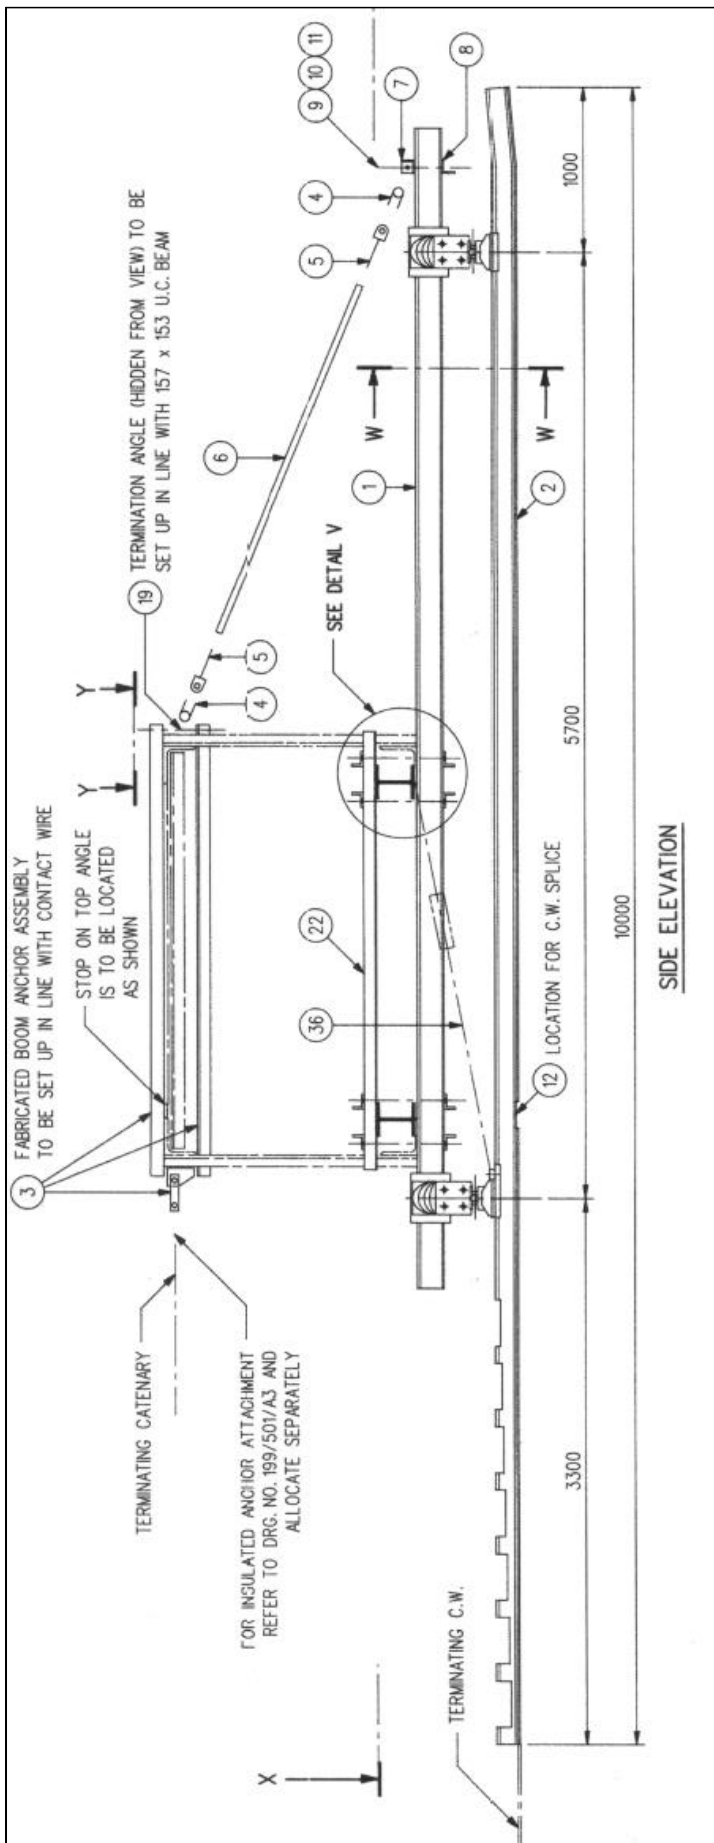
Trowse bridge transition structure: showing transition structure (notched beam) at left hand end (extract from OLEMI drawing 1/113/801/A1)
